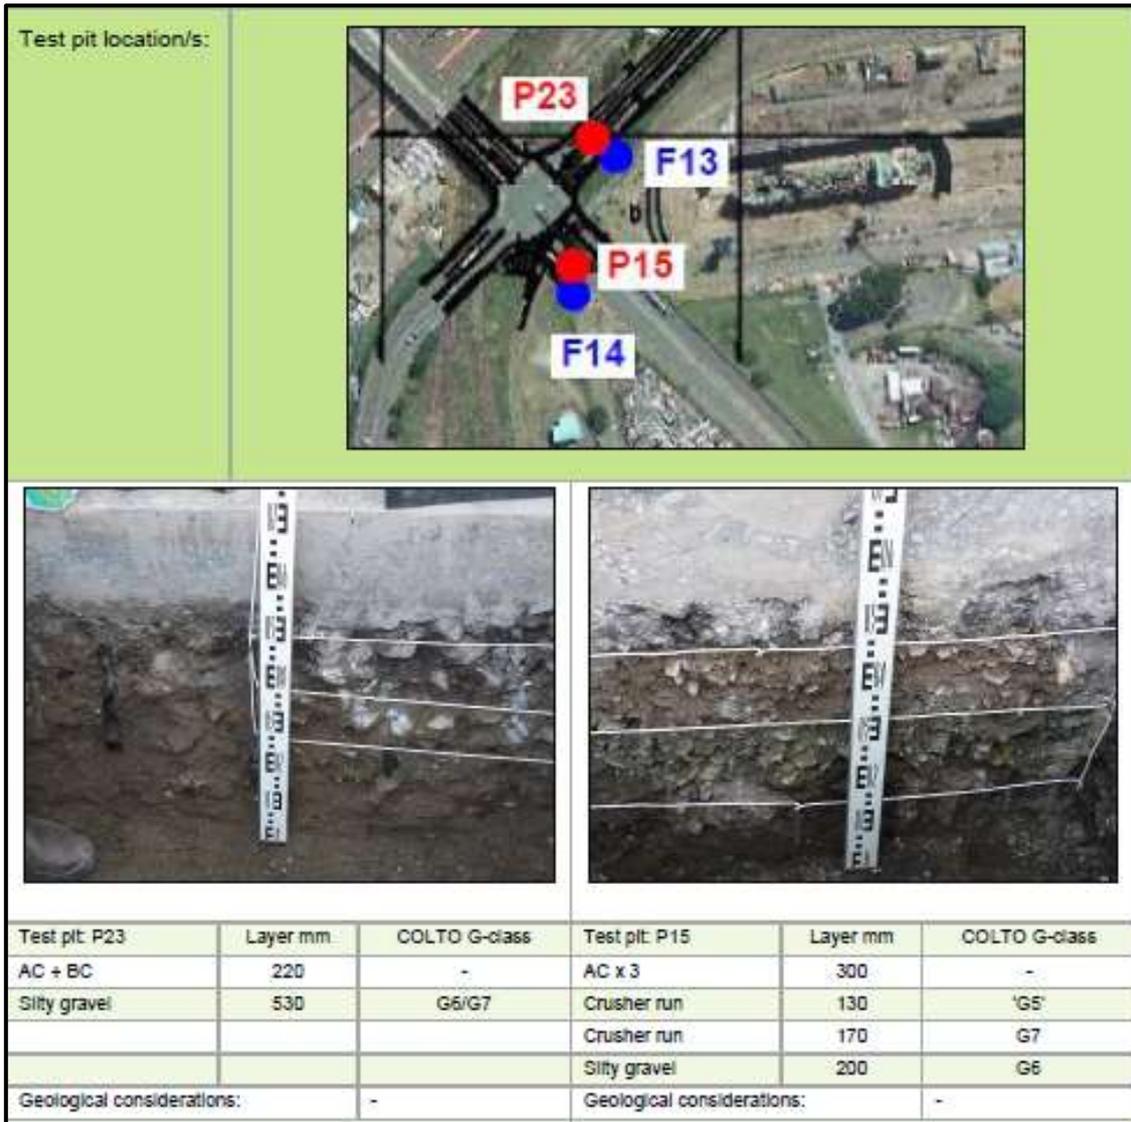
Bayhead/South Coast Road Intersection Test Pit Locations
